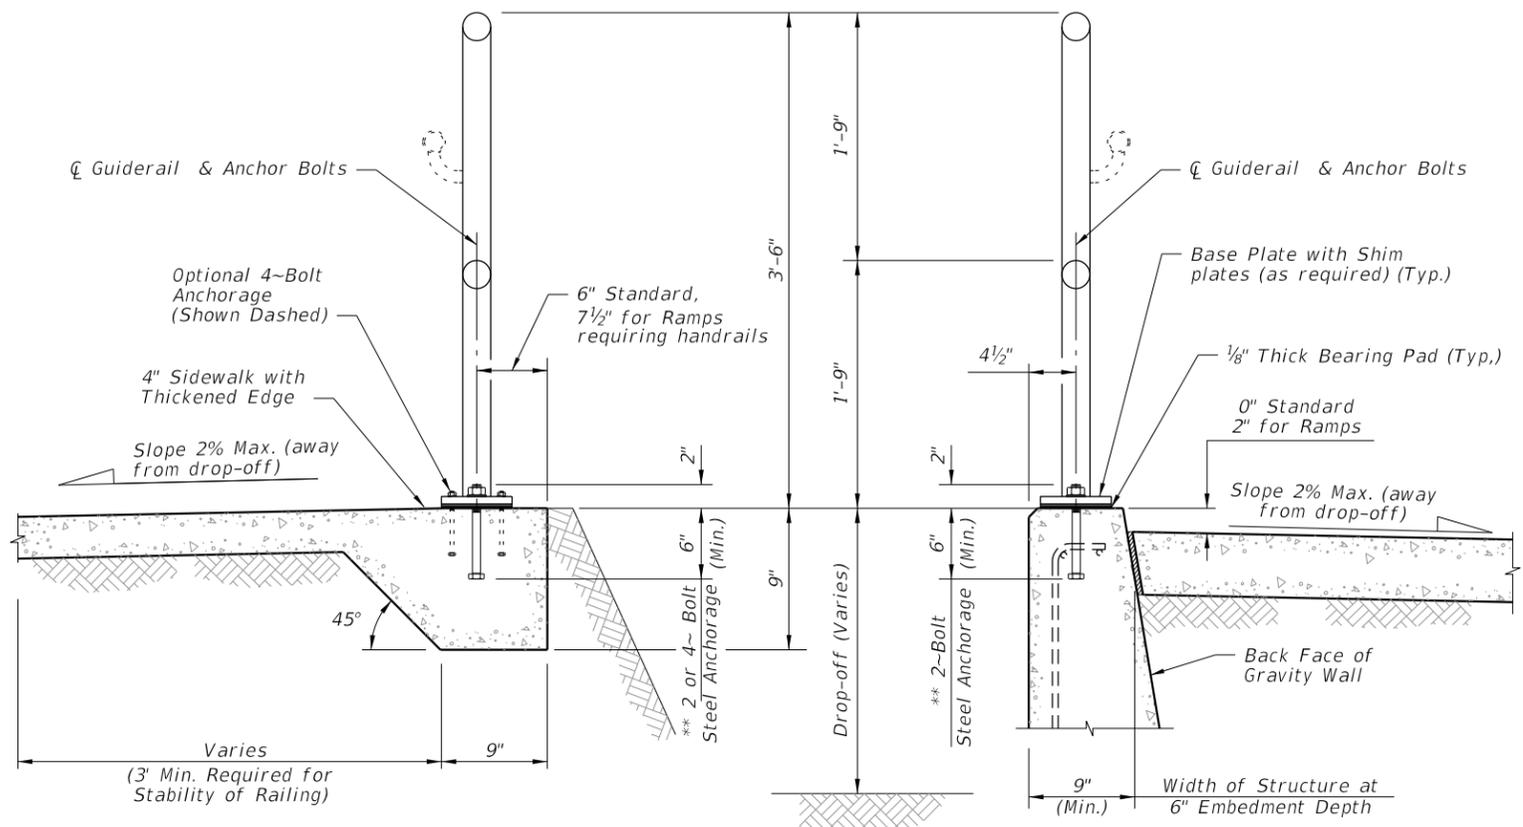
DETAIL "B" - RAIL AND HANDRAIL (Showing Sloped Condition for Ramps with 2-Bolt Anchorage)
